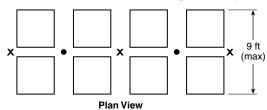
(c) Double-row rack sprinkler layout.
